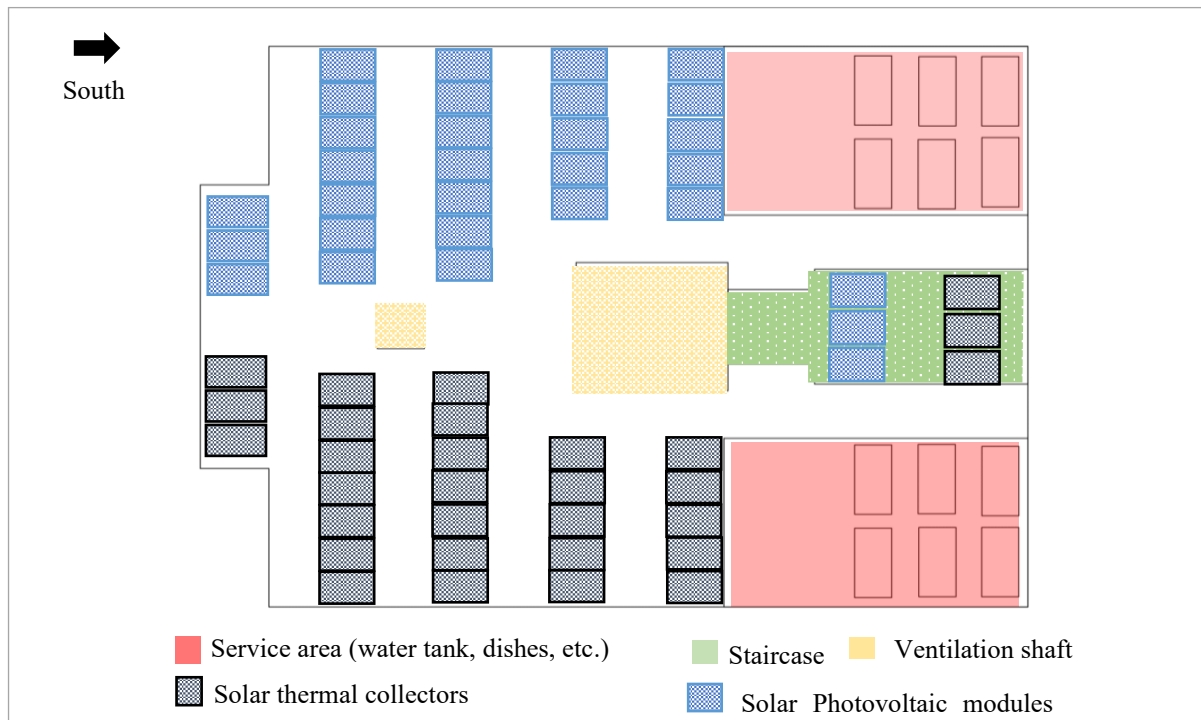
Proposed arrangement for the solar collectors, and photovoltaic module on the roof of residential building, in Amman, Jordan
